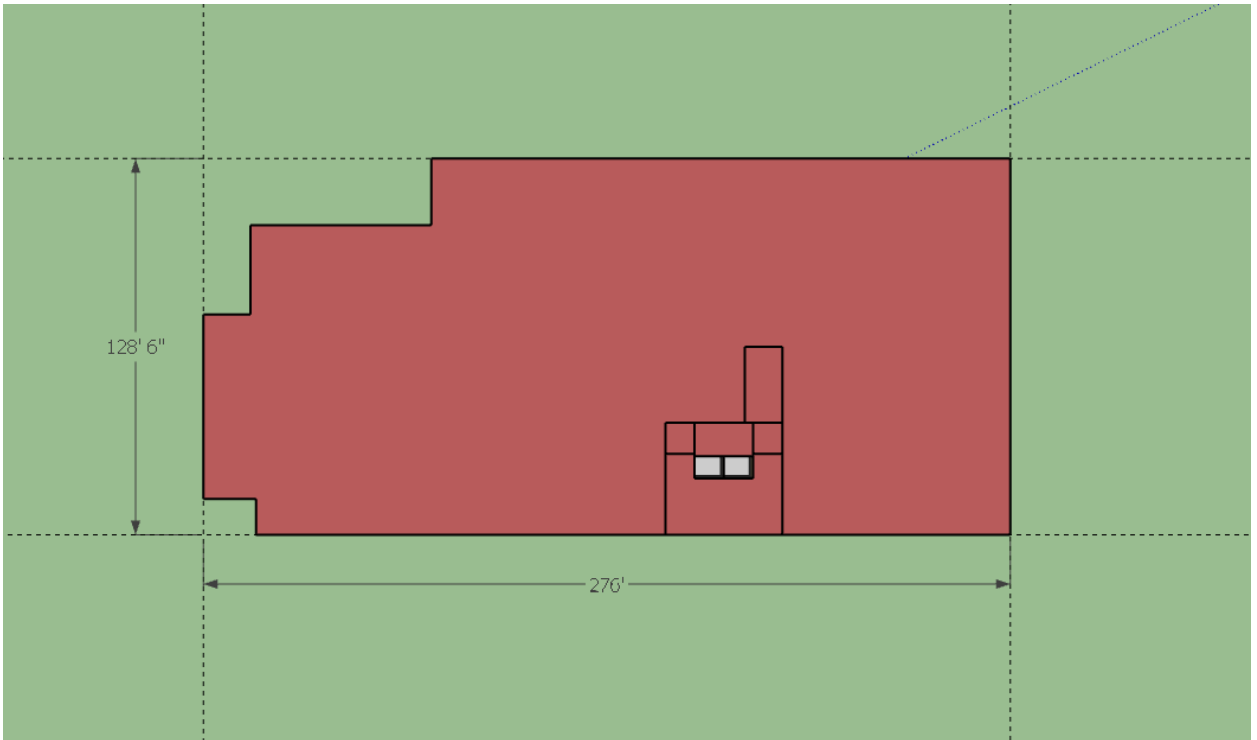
Two-dimensional rendering of the floor plan for the building's underground levels, using SketchUp Pro 2019 and OpenStudio
